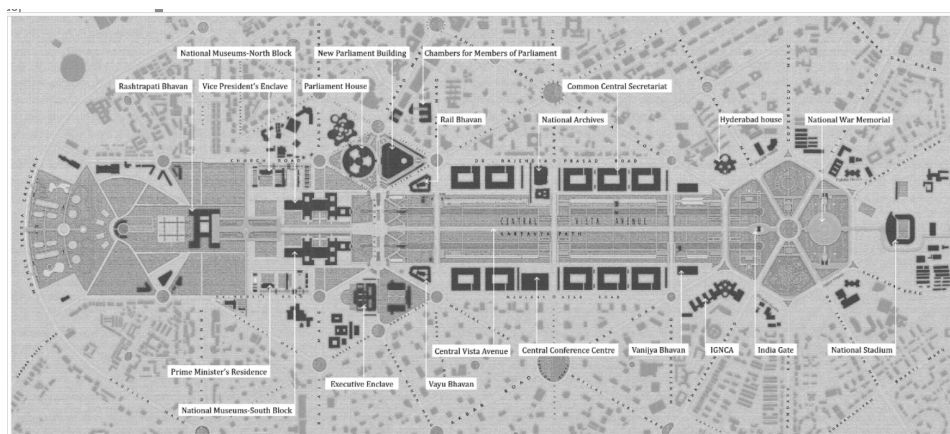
The Proposed Master Plan of Central Vista¹⁴
